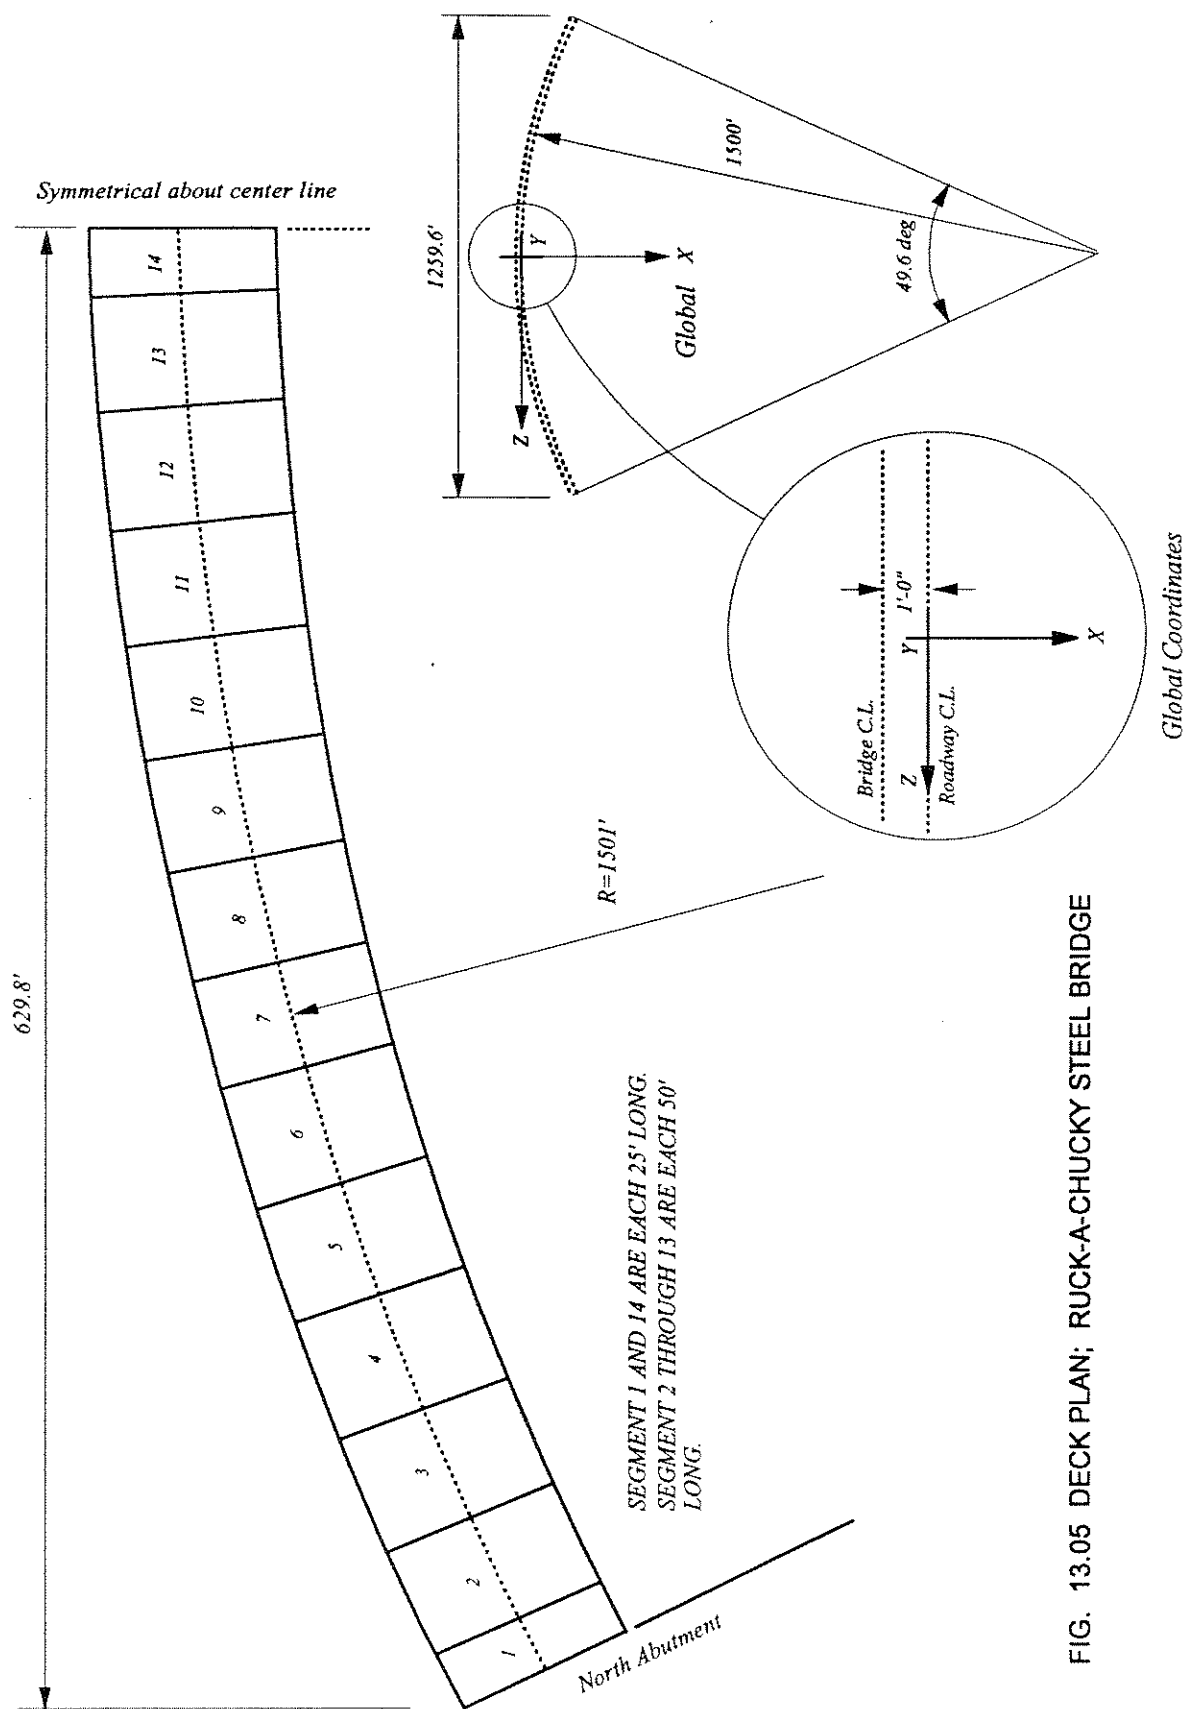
DECK PLAN; RUCK-A-CHUCKY STEEL BRIDGE
